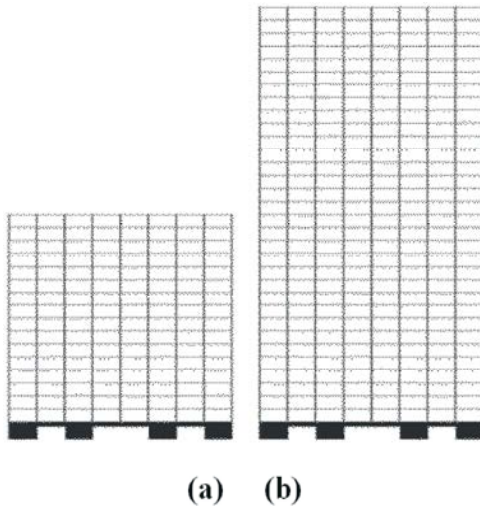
Reinforced concrete geometric models a. 16-storey frame workb. 32-storey frame work
